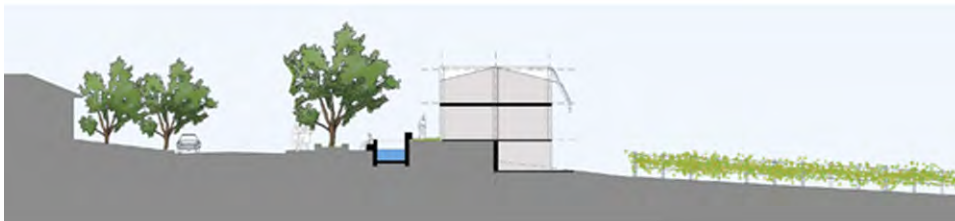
(ABOVE): Section through typical housing module (Author)
